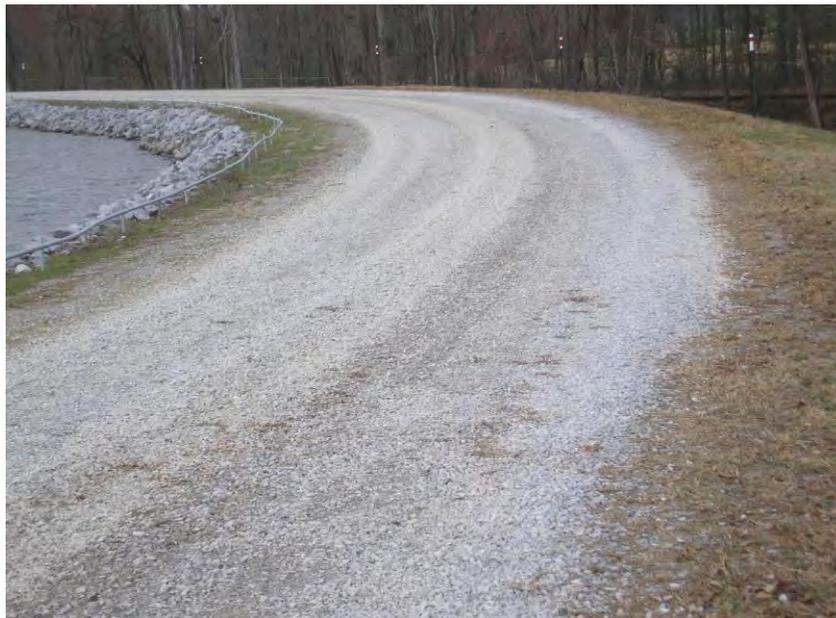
Lower Pond East Embankment Interior North Groin
